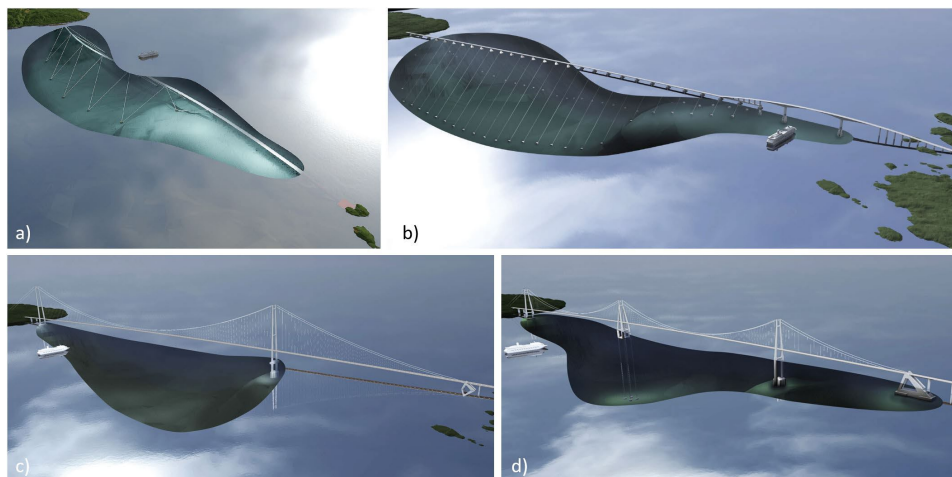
Fjord crossing alternatives in 2011: a) submerged floating tunnel, b) floating bridge, c) suspension bridge, d) floating suspension bridge (TLP).
